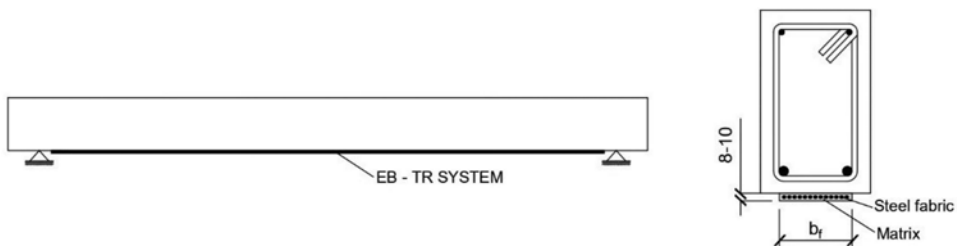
Geometry of the tested beams: RC beam strengthened with EB-TR system.
